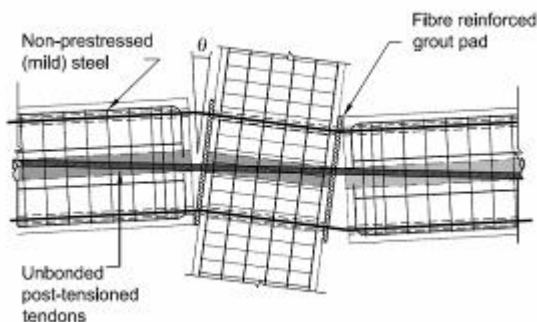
Jointed precast “hybrid” frame and wall systems (fib, 2003; NZS3101:2006).
